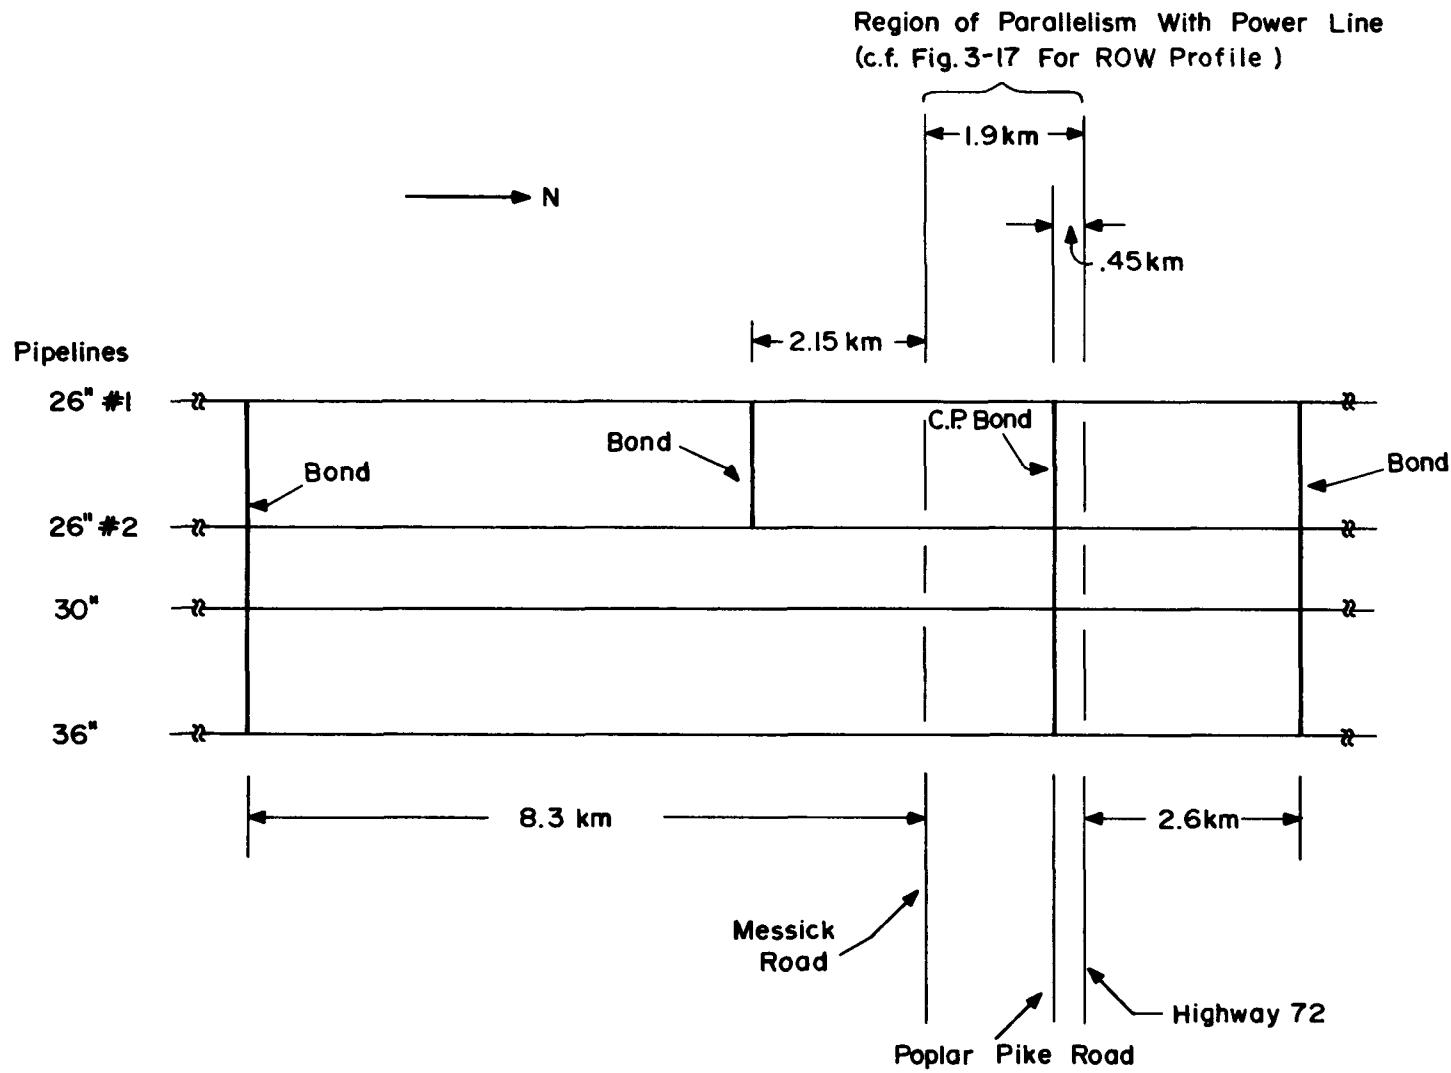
ELECTRICAL BONDS BETWEEN PIPELINES
